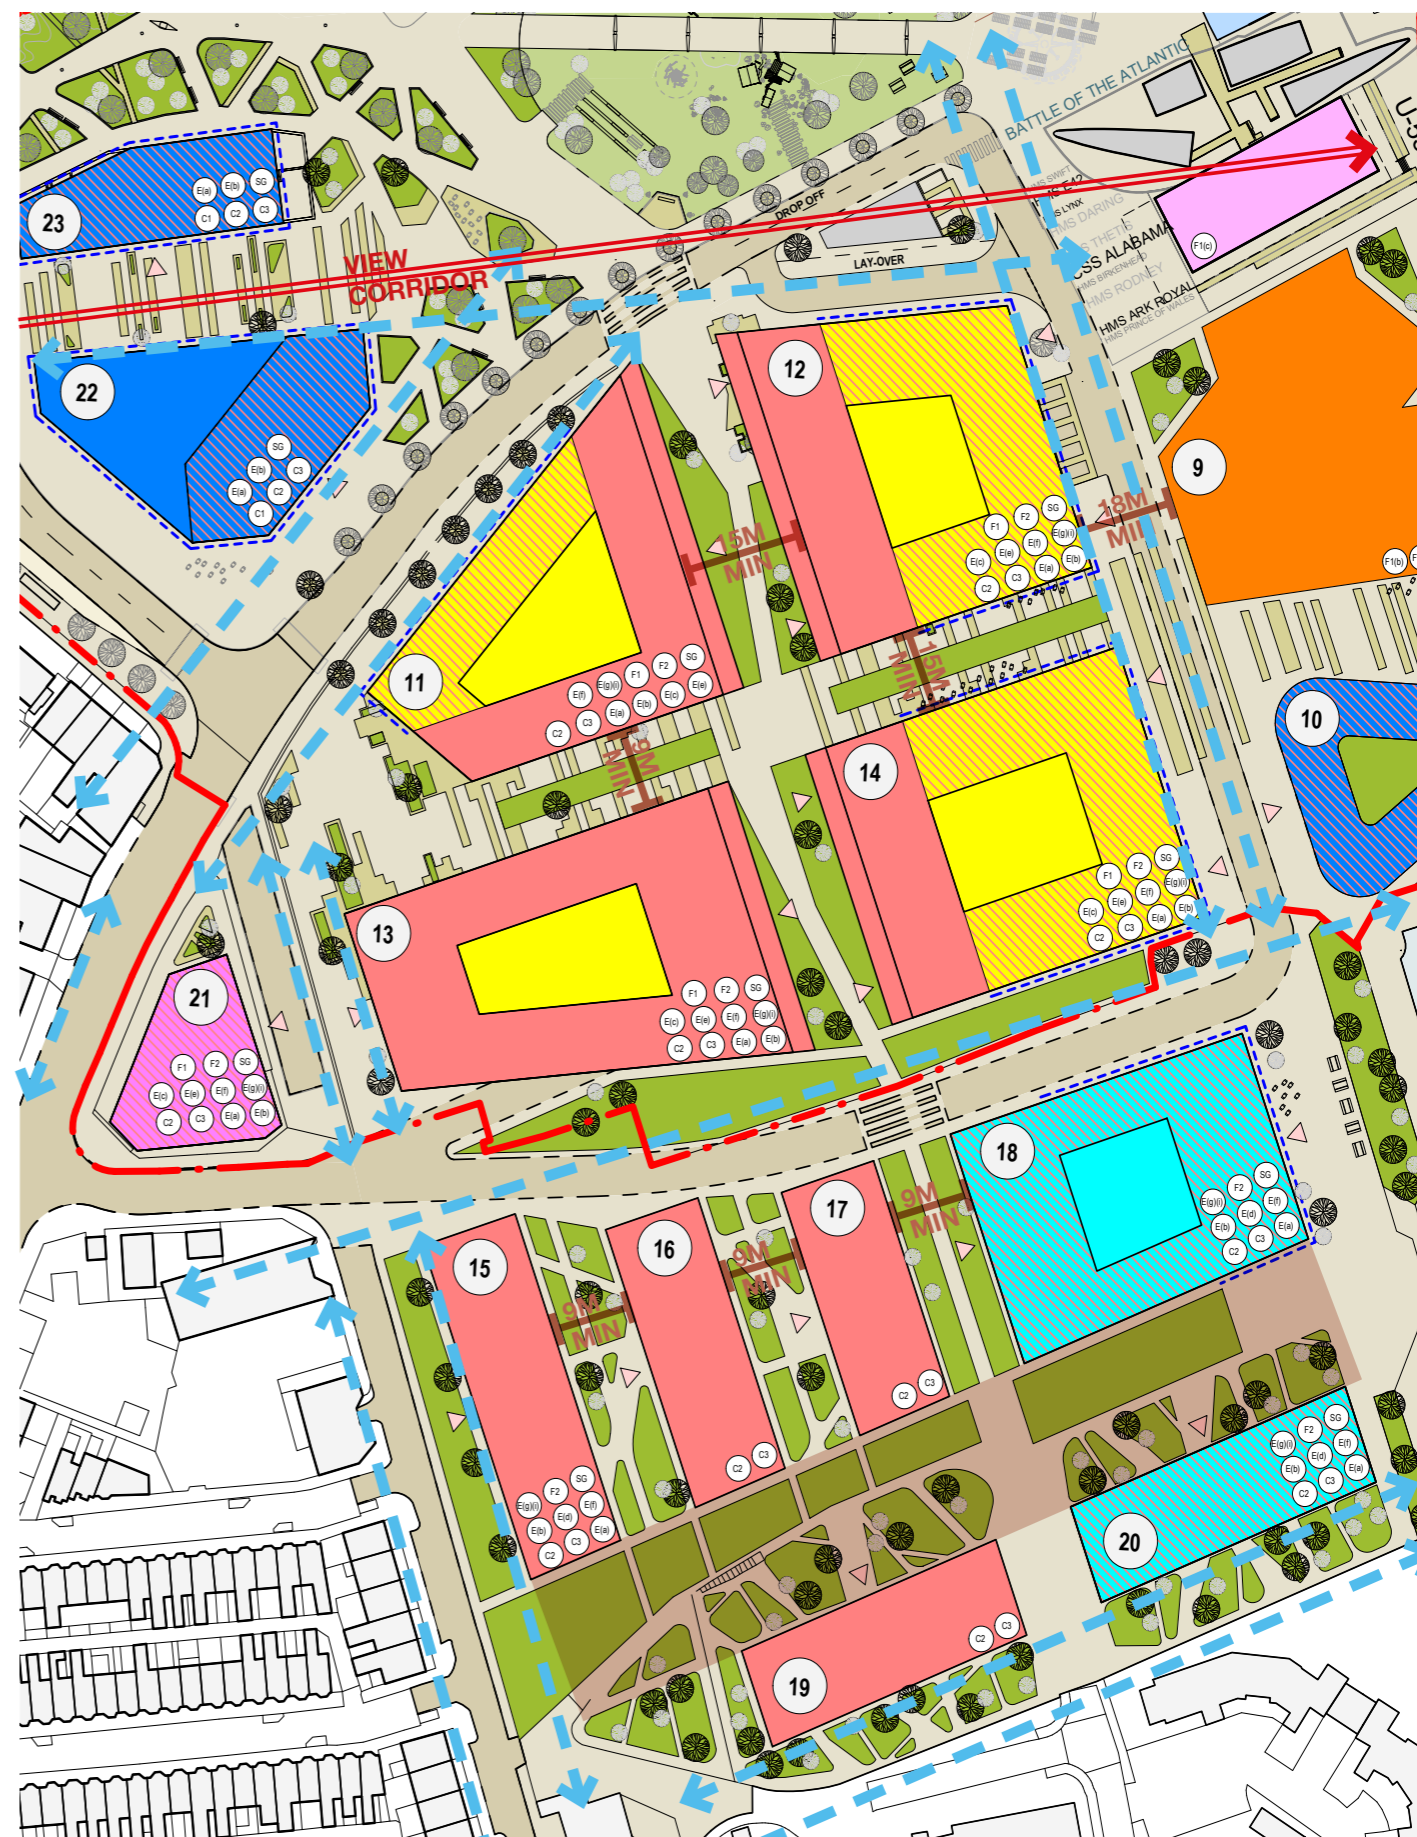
Illustrative Masterplan Parameter Land use Plan
